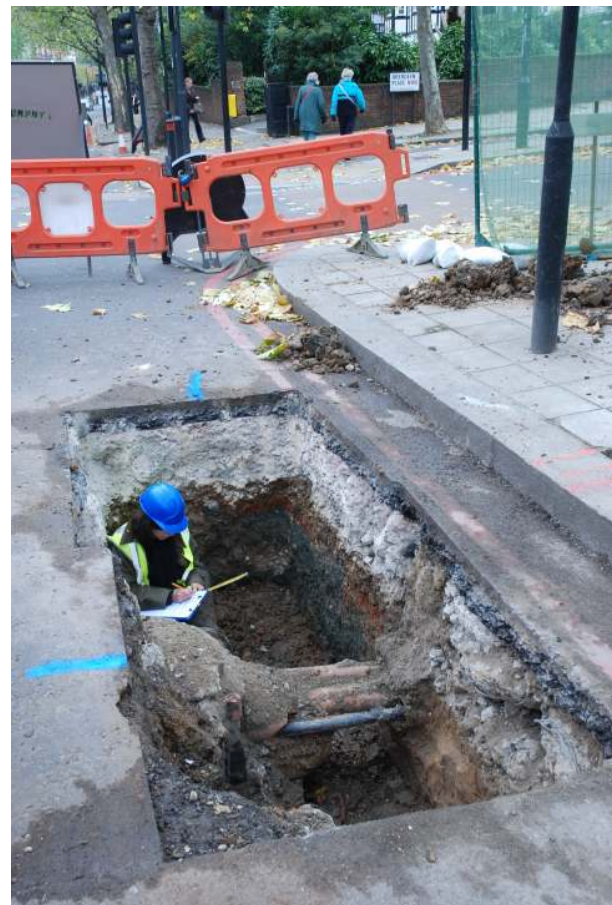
Photo of trench on Edgware Road (5) from the south-west
